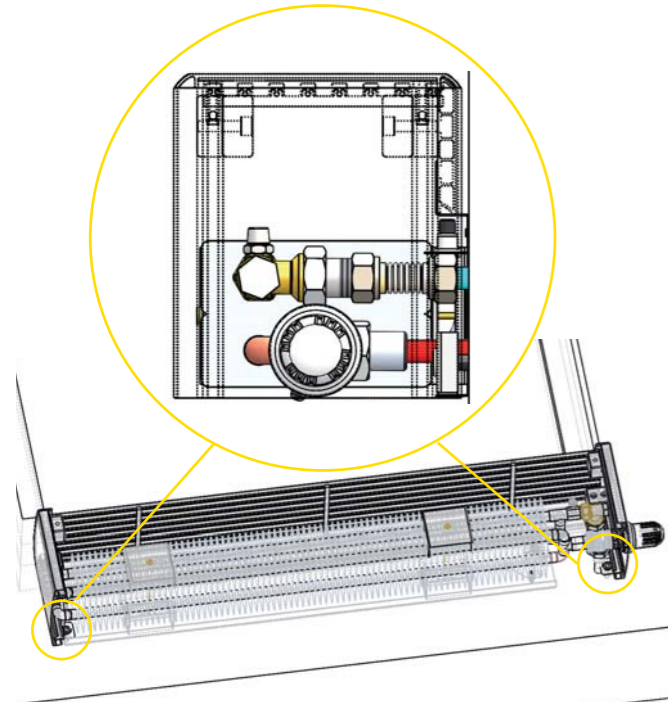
Adjust the vertical position of the convector using the adjustment screws at the bottom of the convector body.
